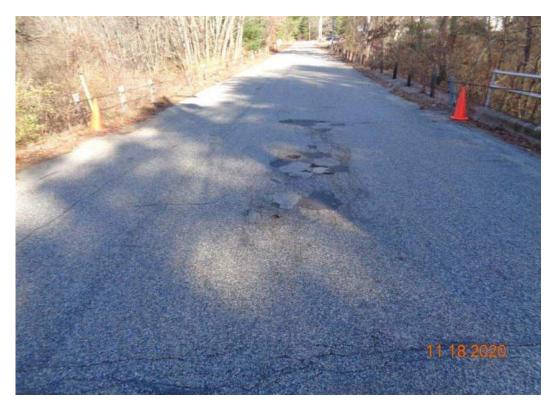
Bridge wearing surface, from Abutment 1 looking to Abutment 2
